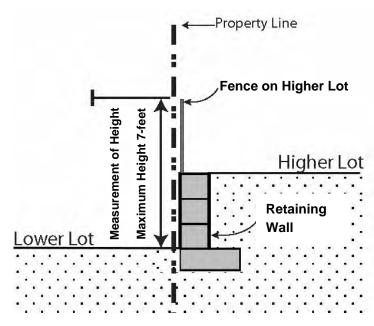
Measurement of Retaining Wall and Fence Located on Higher Lot
